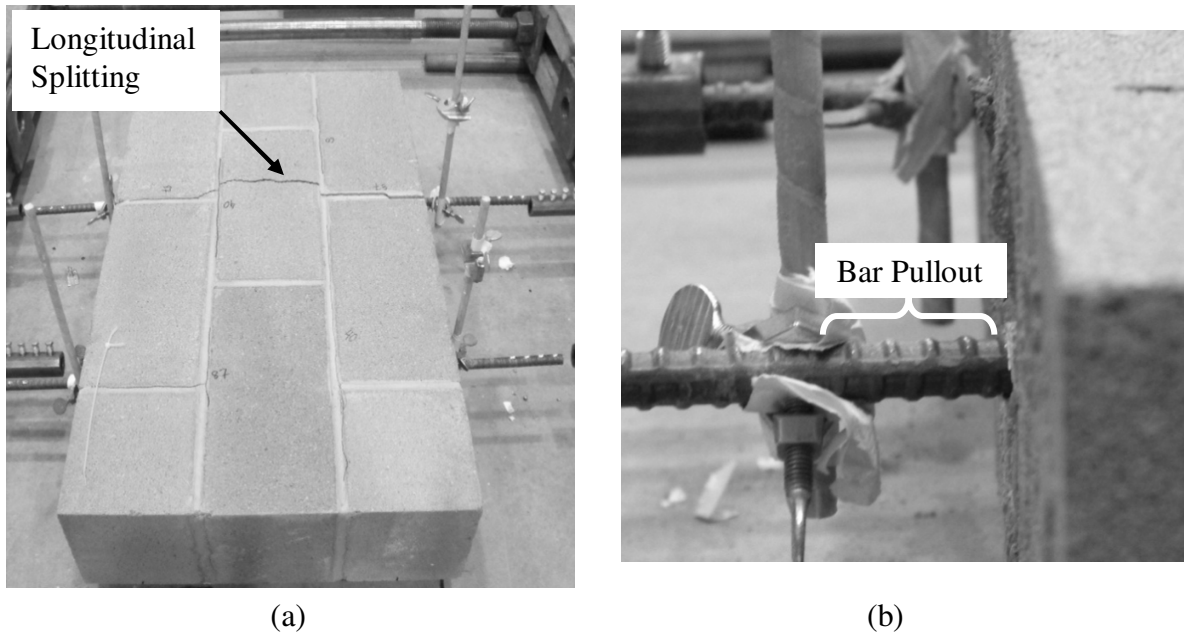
Bar pullout failure with longitudinal splitting - Specimen CP-4:
